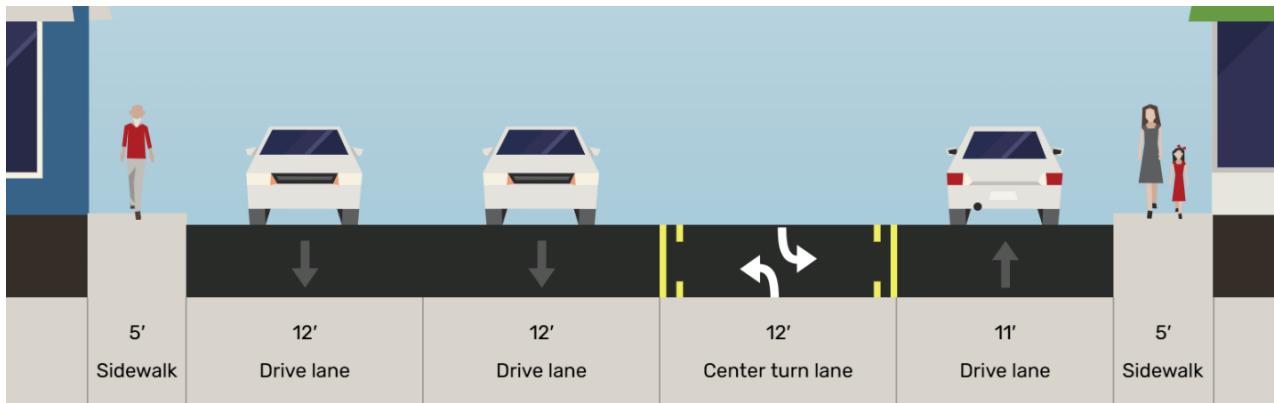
BROADWAY - 28TH STREET TO 20TH STREET
